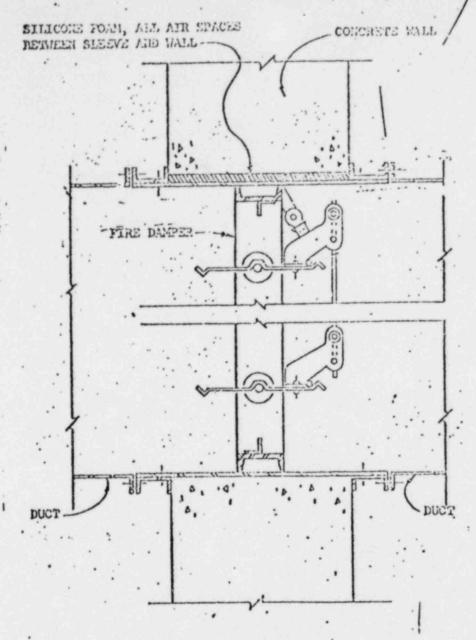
B.(iii)-3 TYPICAL FIRE DAMPER PENETRATION FIRE STOP
